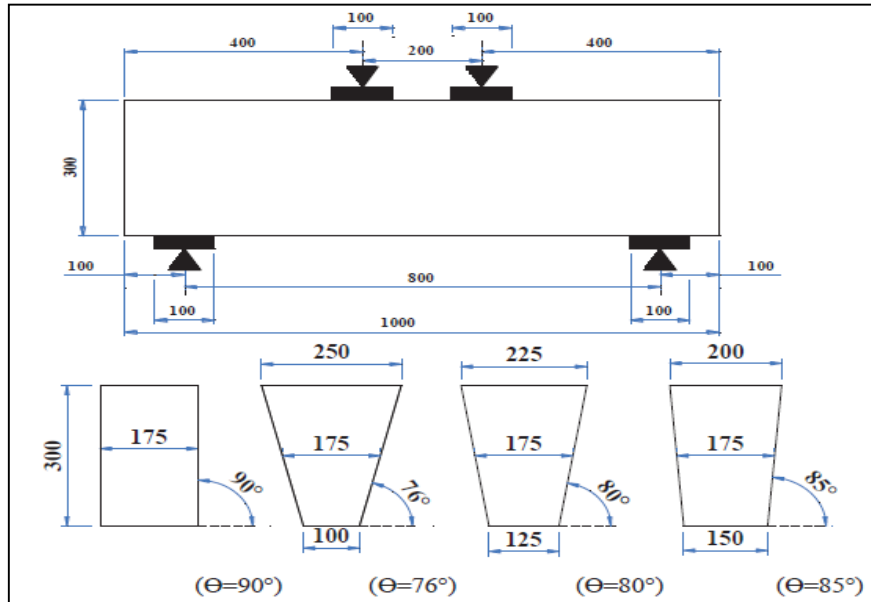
Cross sections details and dimensions of the tested beams [52].
